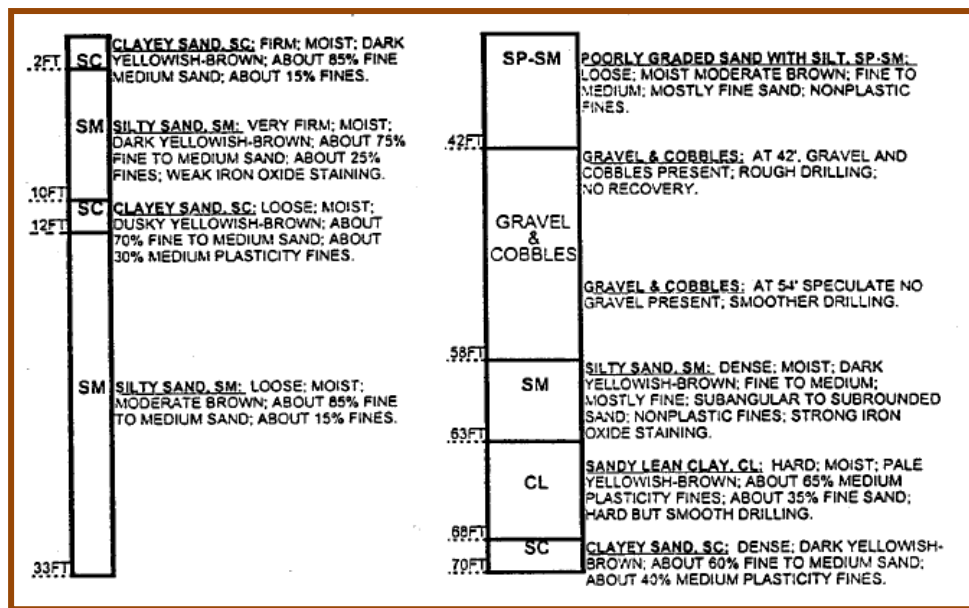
Subsurface profile of slurry wall site in Sacramento, California
